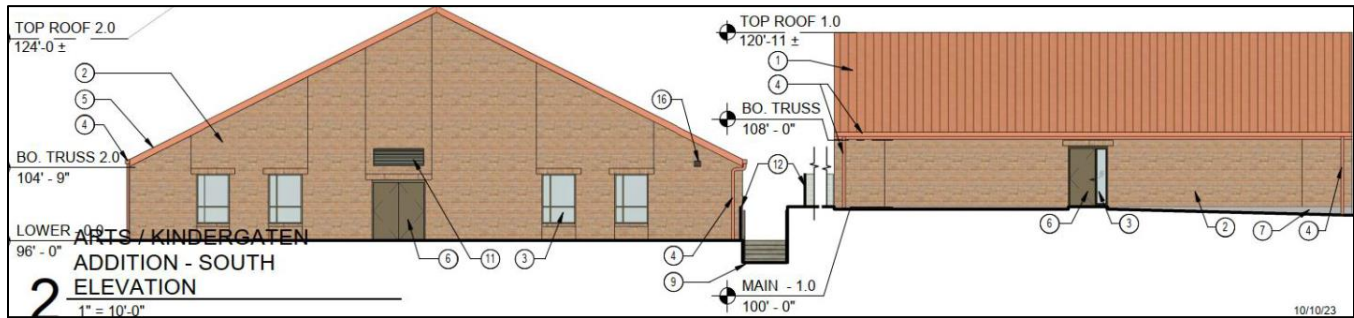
South Elevation Fine Arts and Kindergarten Addition
